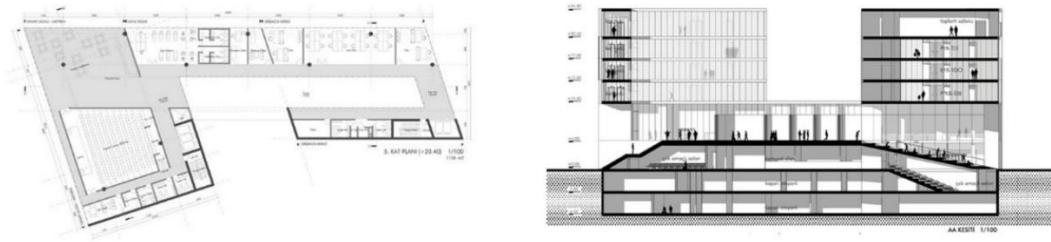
2D plan and section drawings of İZKA competition entry of SCRA
